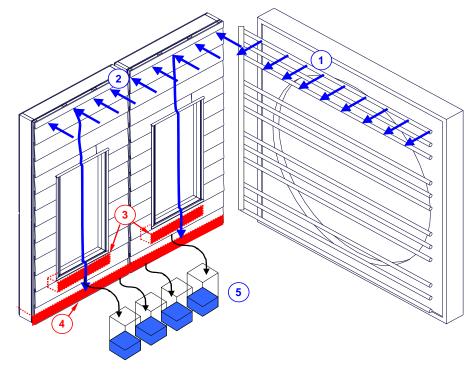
Schematic of apparatus (on right) and 2.44 by 2.44-m test specimen (on left). Water at (1) is sprayed onto cladding surface (2) and water cascades down onto specimen. Water entering deficiencies collected in troughs beneath window at subsill (3) or at base of wall (4). Water then diverted to calibrated collection vessels (5).
